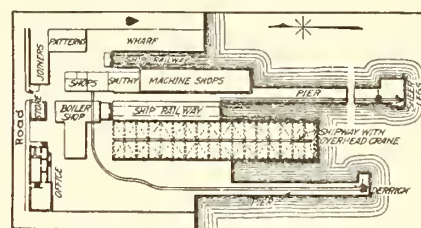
Wallace Shipyards, Ltd., plant, North Vancouver.
